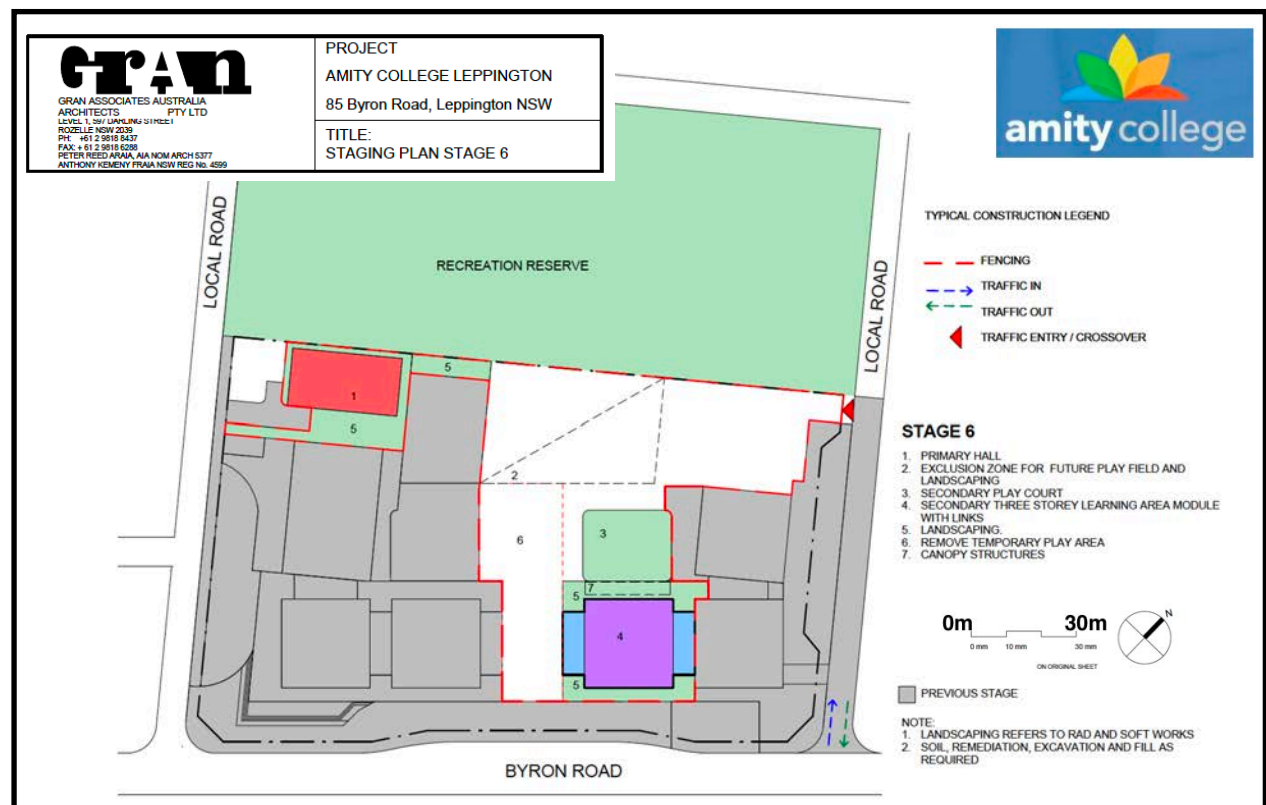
Proposed Stage 6 of Amity College school campus- Primary School additions, basement car parking and outdoor open space
